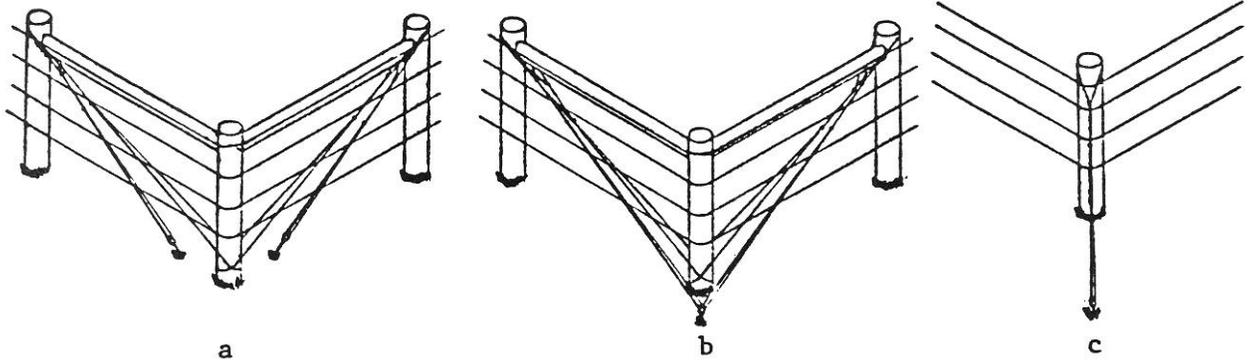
Fence corner assemblies. (a) corner with two anchors and single-brace assembly; (b) corner with one anchor and single-brace assembly; (c) corner with one anchor and no brace assembly.
